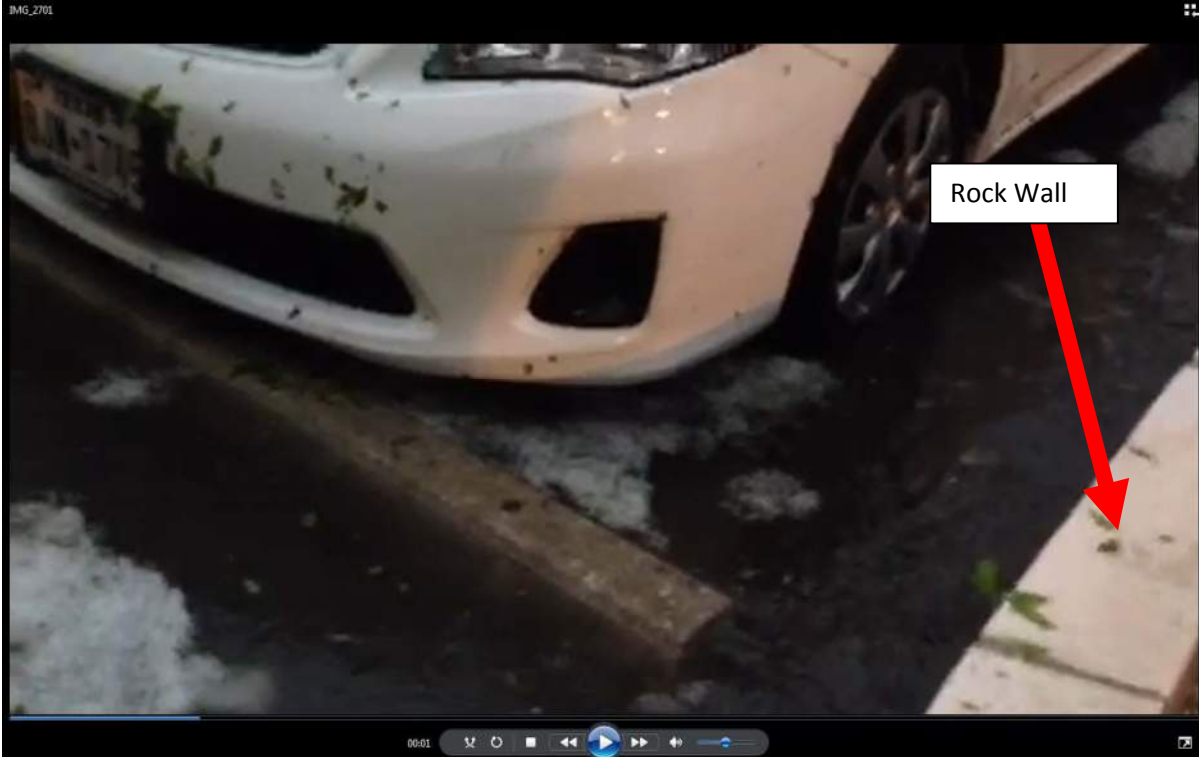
rock wall constructed by Courtyard Condominiums to keep water out of complex
